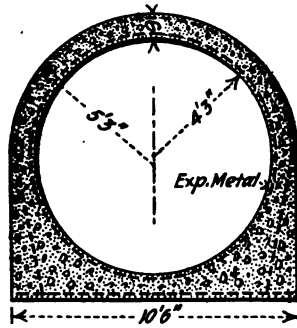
Cross-Section of $8\frac{1}{2}$ -Ft. Sewer, Torresdale Filler Conduits.
